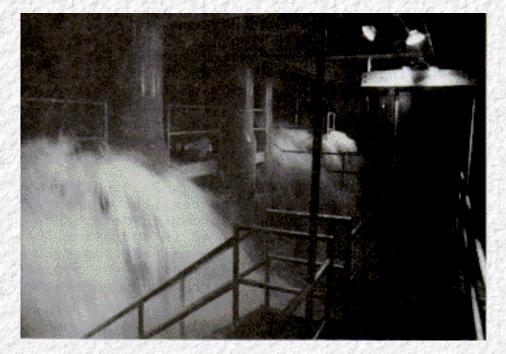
Rectangular Pit Vertical Pumps Under Test by Recirculating Through Discharge Manifold
